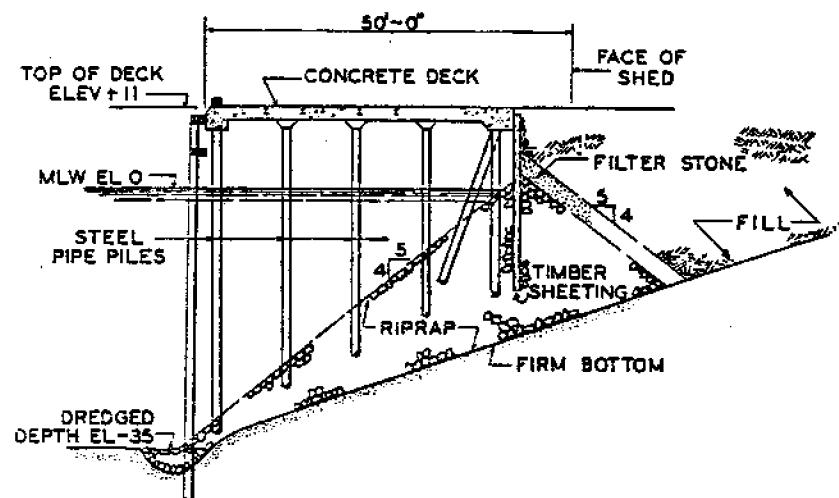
High-level Fixed Wharf Construction (AAPA, 1964, p. 38)
